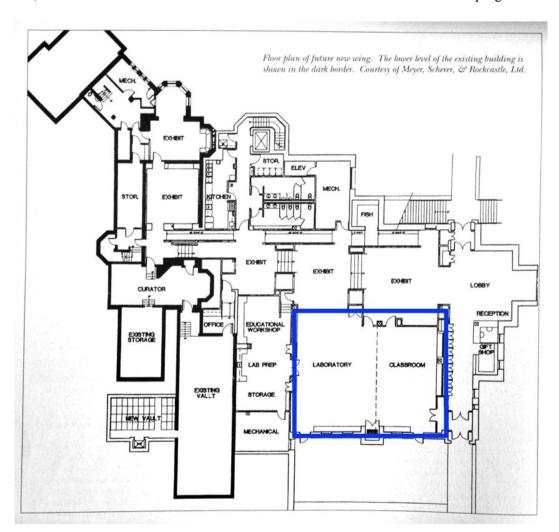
The floor plan of the lower level of the New Wing. The existing building was drawn in the thicker border. Two biggest rooms for educational purpose in the blue border[added by the author], laboratory and classroom, are distinct. Courtesy of Meyer, Scherer, & Rockcastle, Ltd. ["New Wing to Be Built," *The Bakken Library & Museum*, Vol. 19, No. 1, p. 2, Spring 1997.]
